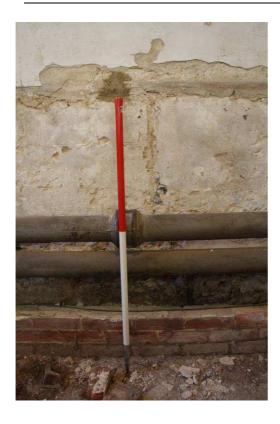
South aisle, front rail scar, looking south, scale 1x1m.
